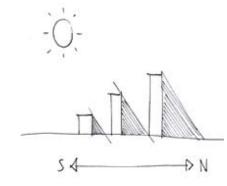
sketch showing taller buildings towards north of the site to avoid blocking of sun and undue shadowing.
